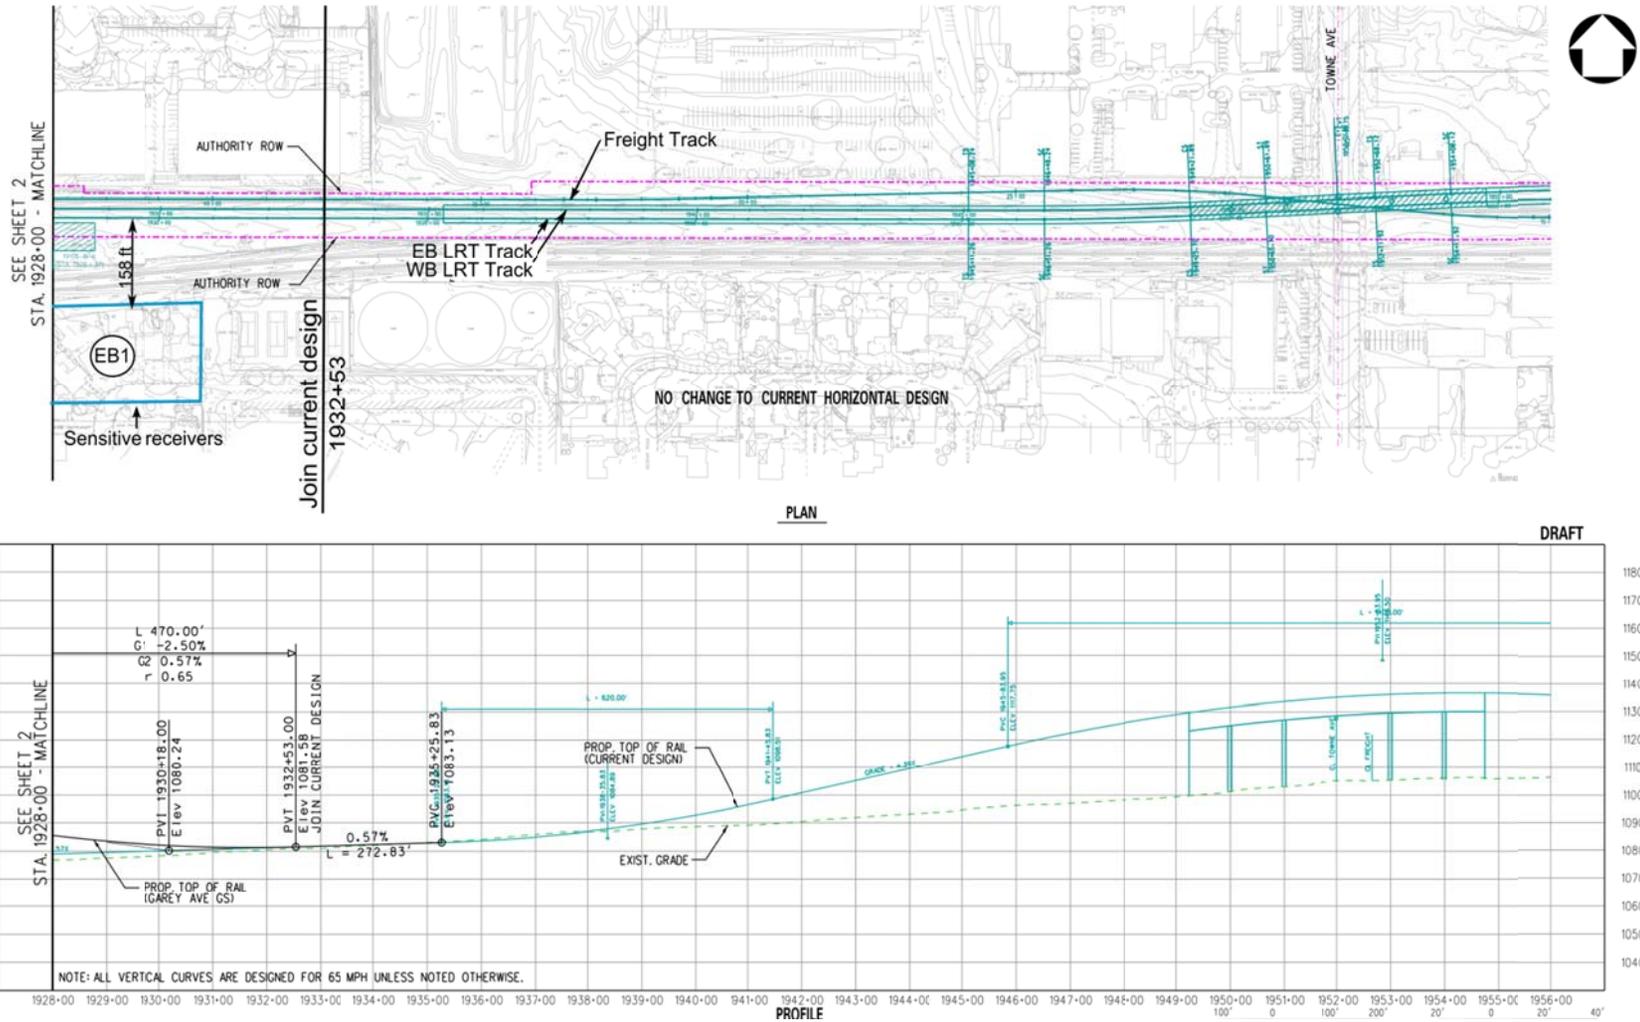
Plan and Profile of Garey Avenue LRT Bridge (Page 2)
